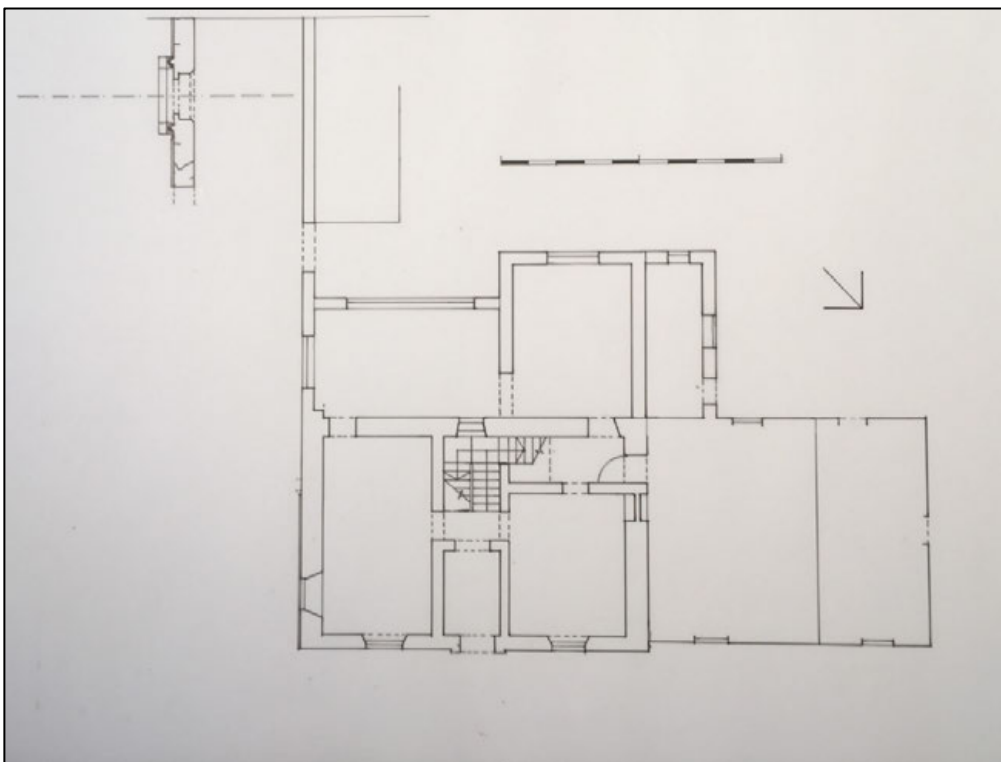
Ground floor plan of the farmhouse drawn by Martin Roberts. Note the off-centre position of the N entrance doorway in relation to the hall passage.
